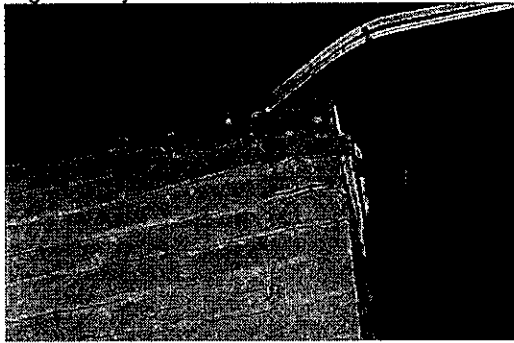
Interior, Passage (space T03). Detail of introduced electrical conduit that has inappropriately damaged the brick wall above the door into the office (space T02).
